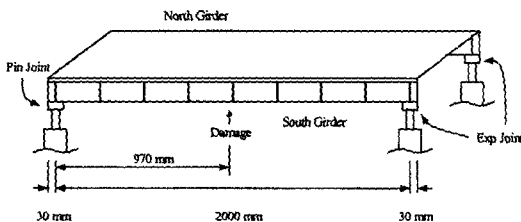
Elevation View of Steel Plate-Girder Bridge
